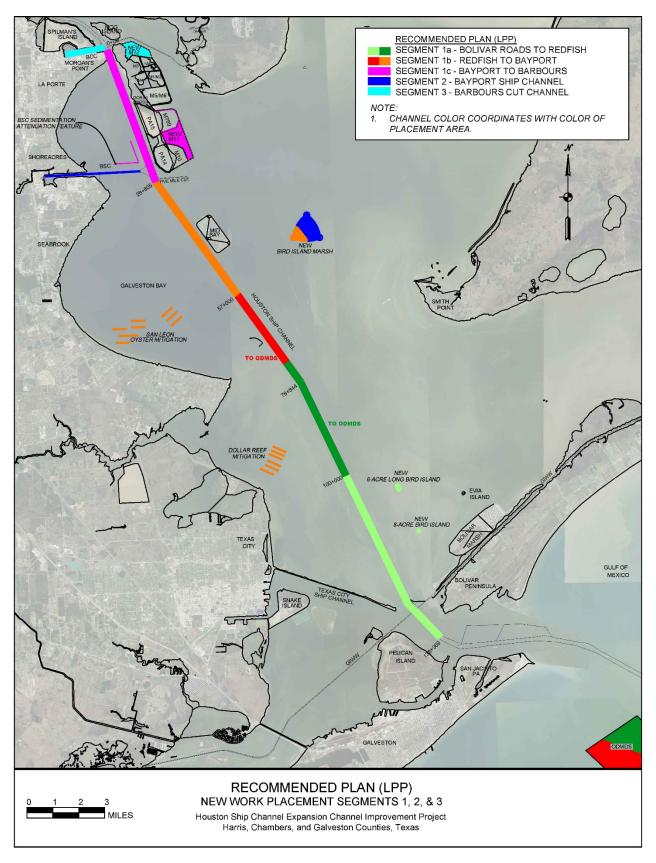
Recommended Plan (LPP) New Work Proposed Placement Segements 1, 2 & 3
